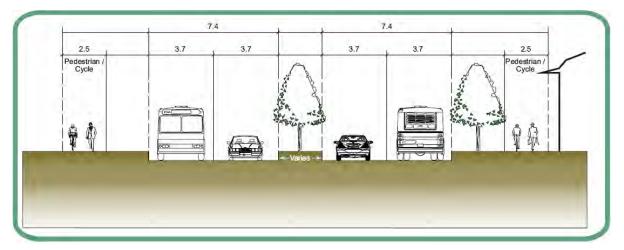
Old Airport Road – Example of a Typical Cross-Section
